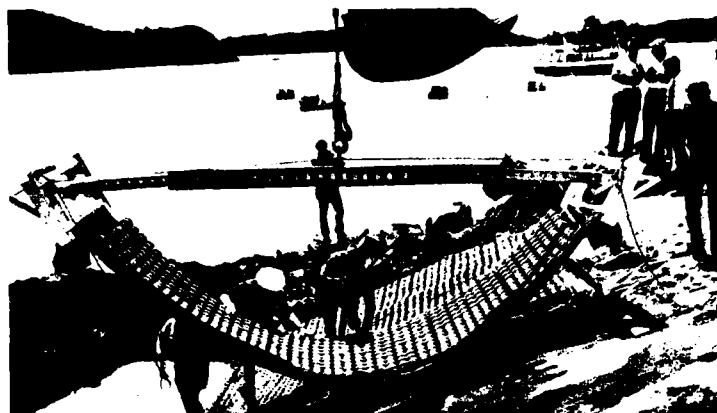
Mobile crane lowers carrier fabric mat onto bank. The mat is constructed by attaching precast blocks to a carrier fabric with adhesive. The completed mat is then placed at the project site (photograph courtesy of ERCO Systems, Inc.)
